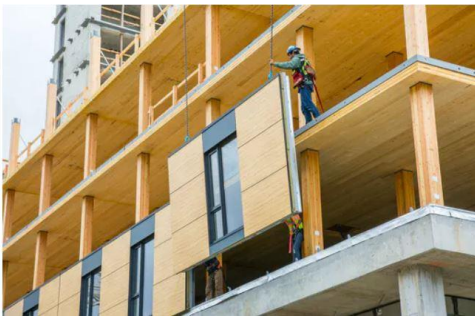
University of British Columbia 18-story building under construction using CLT of floors and walls and glu-lam posts.
